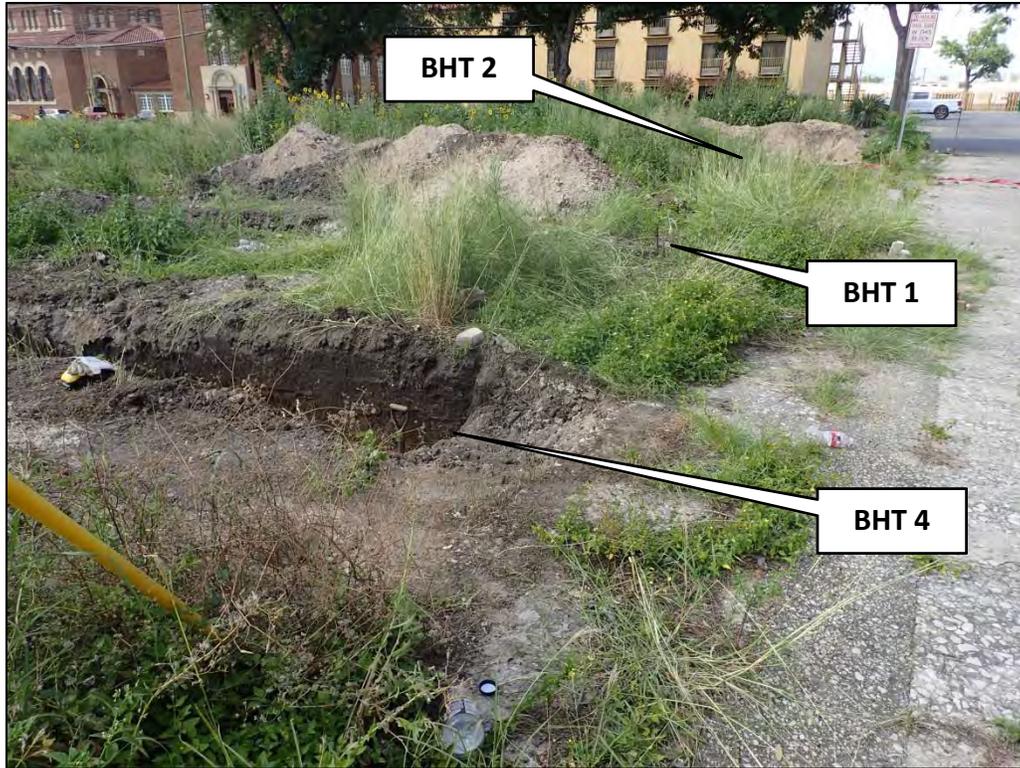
Location of BHT 1, 2, and 4 northwest of alley, looking northeast.
